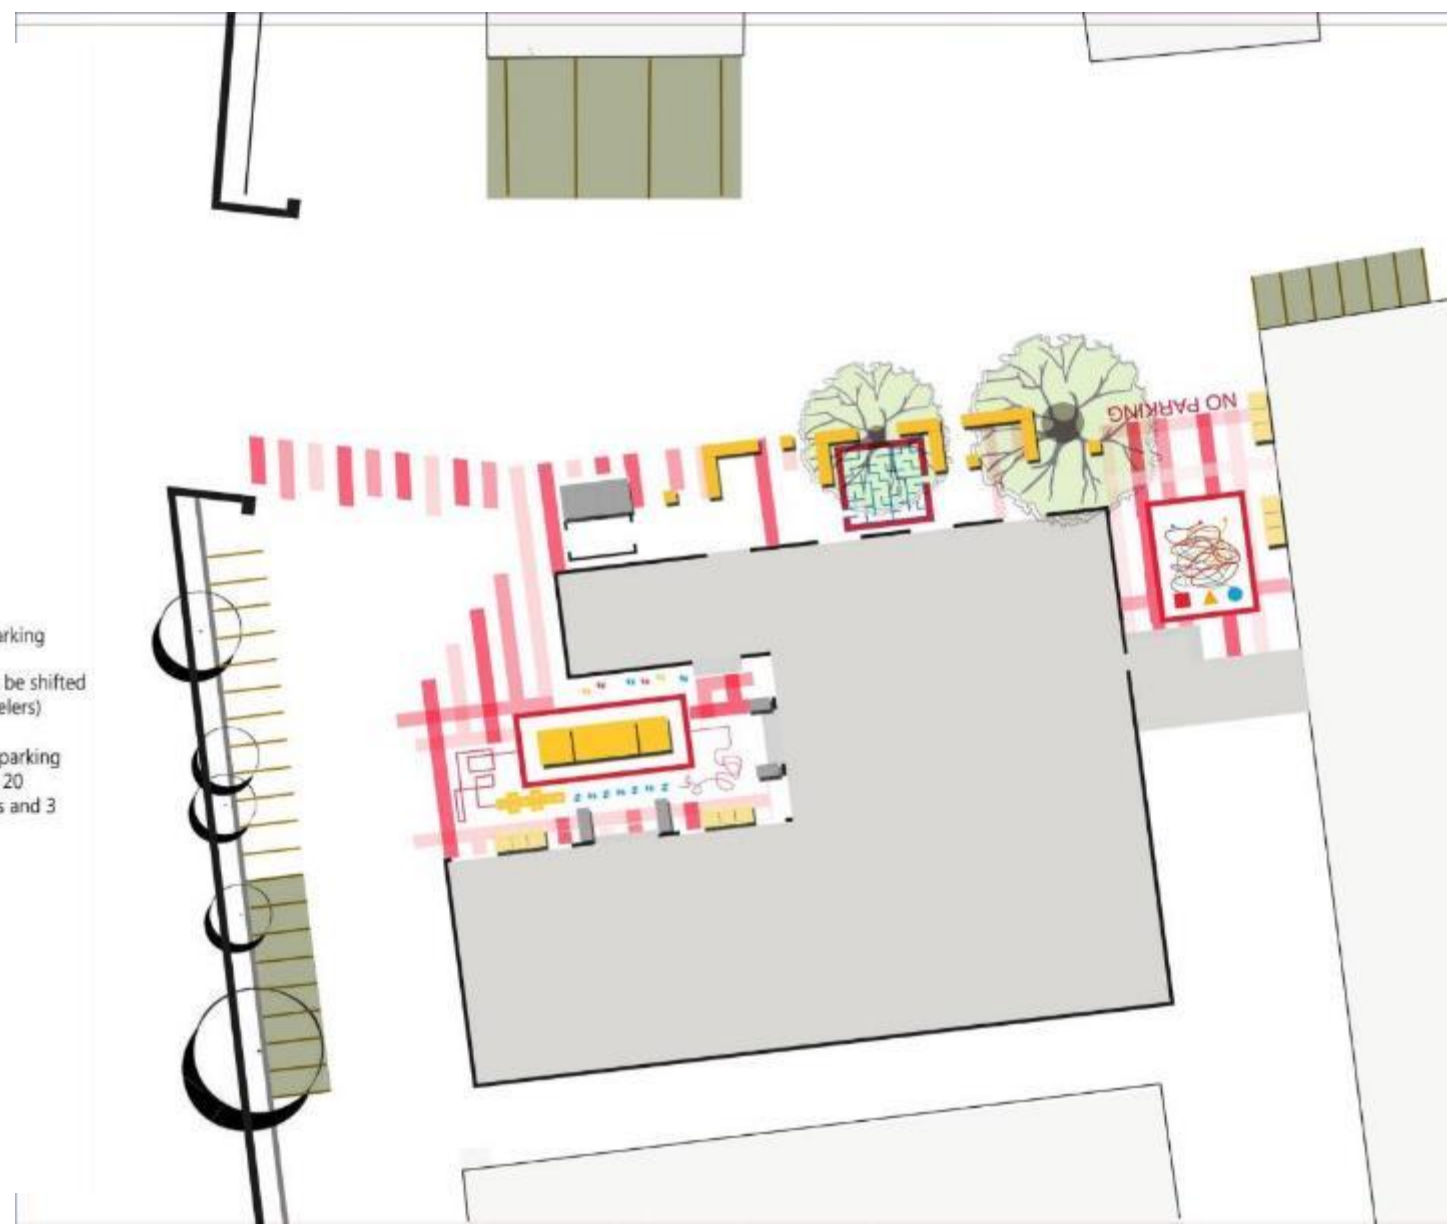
B PROPOSED CONCEPT PLAN
